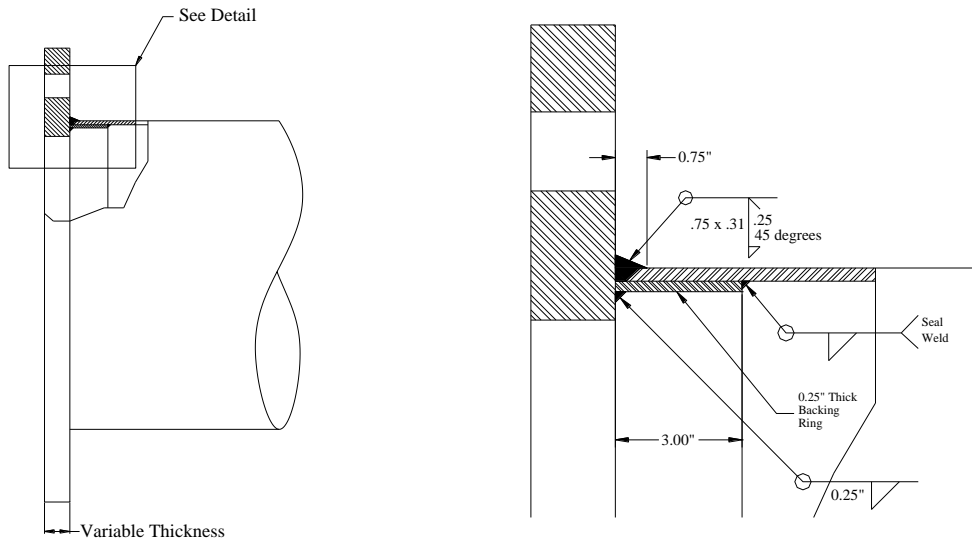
Typical "Wyoming" HMIP weld detail (Stam, 2009)
